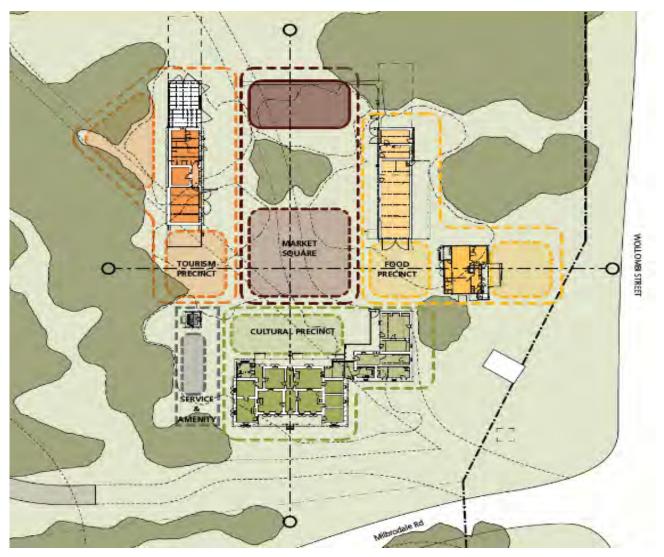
Broke Village Conceptual Precinct Plan
